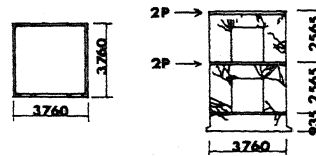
Plan and bottom joints layout (C test Ref. 3)
